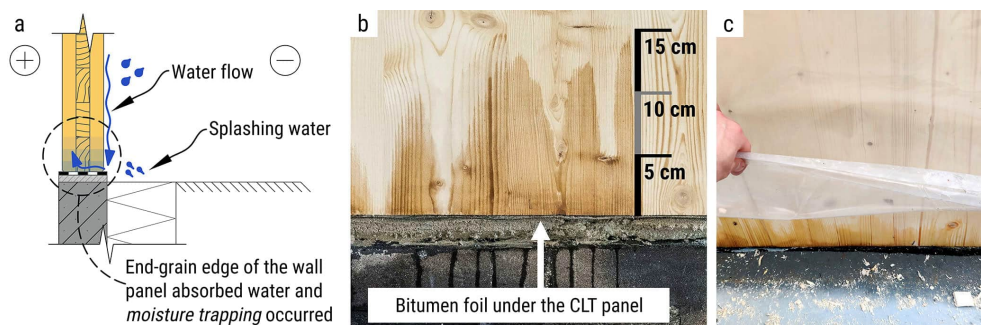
CLT wall panel and foundation connection joint (a). The bottom edges of wall panels absorbed moisture despite bitumen strips under the CLT panels (b & c). Photo b = building B, photo c = building C.
